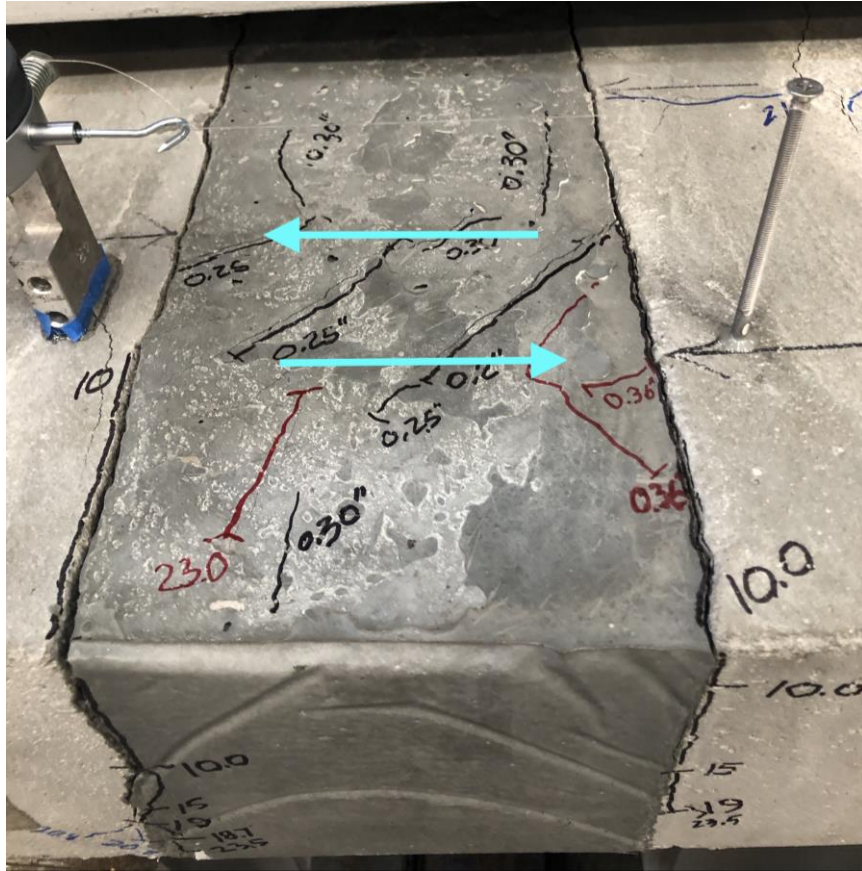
Photo. Measured crack width of crack at UHPC and precast concrete interface.
